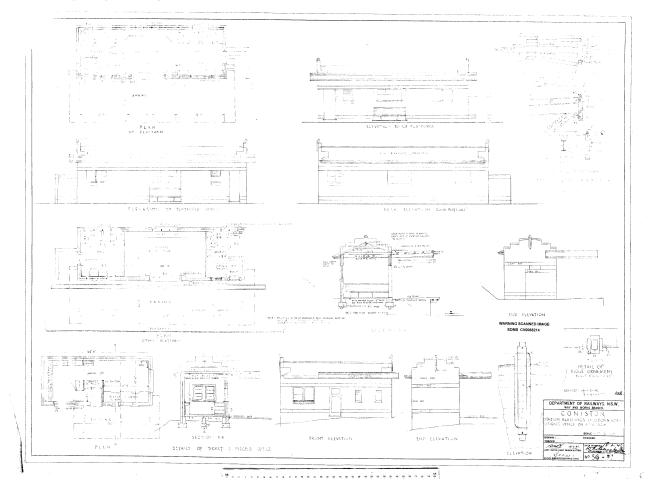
Architectural drawings of the 1941 Coniston station platform buildings and the ticket and parcel office (Source: Provided by Marsupial Lion, 28 April 2022)
